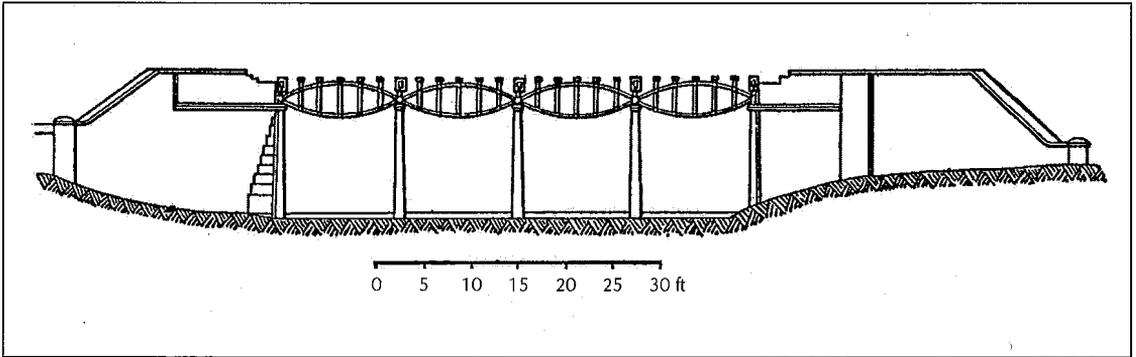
Stockton & Darlington Railway Bridge (1823).
